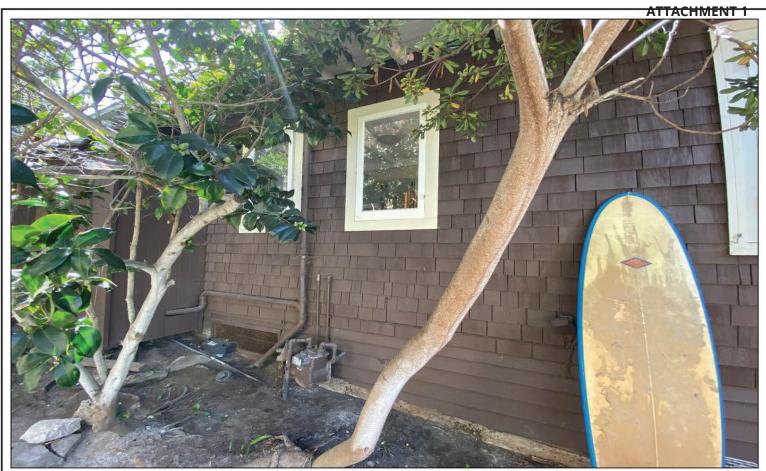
View of the North Façade of the Harriet Cottage, Facing Southeast 825-827 Coast Boulevard South
